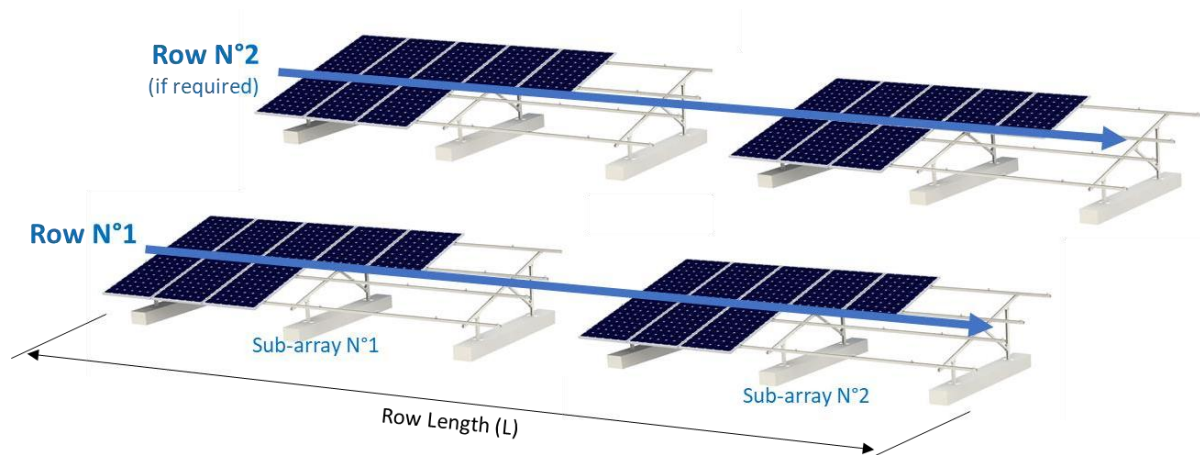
PV array layout and definition (valid for ground-mounted or rooftop installations)
